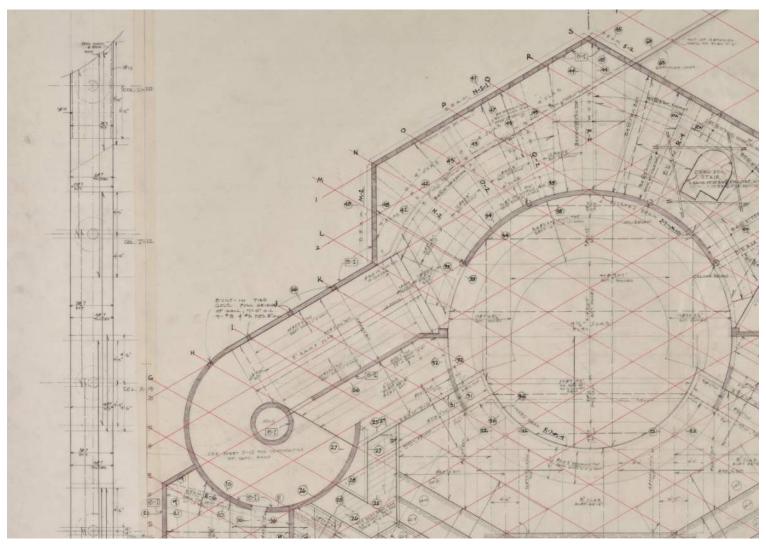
S-16 Main Floor Structural Plan Excerpt, courtesy of Avery Library Archives.
